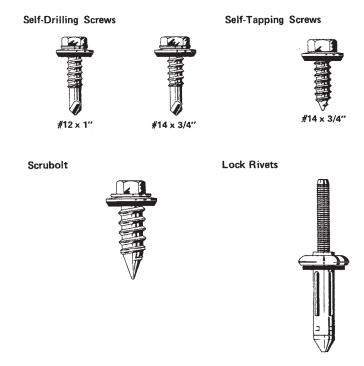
Fasteners used by one manufacturer to attach through-fastened roofing to purlins and to one another. (The scrubolt is used only for attachment to purlins.) (*Butler Manufacturing Co.*)
